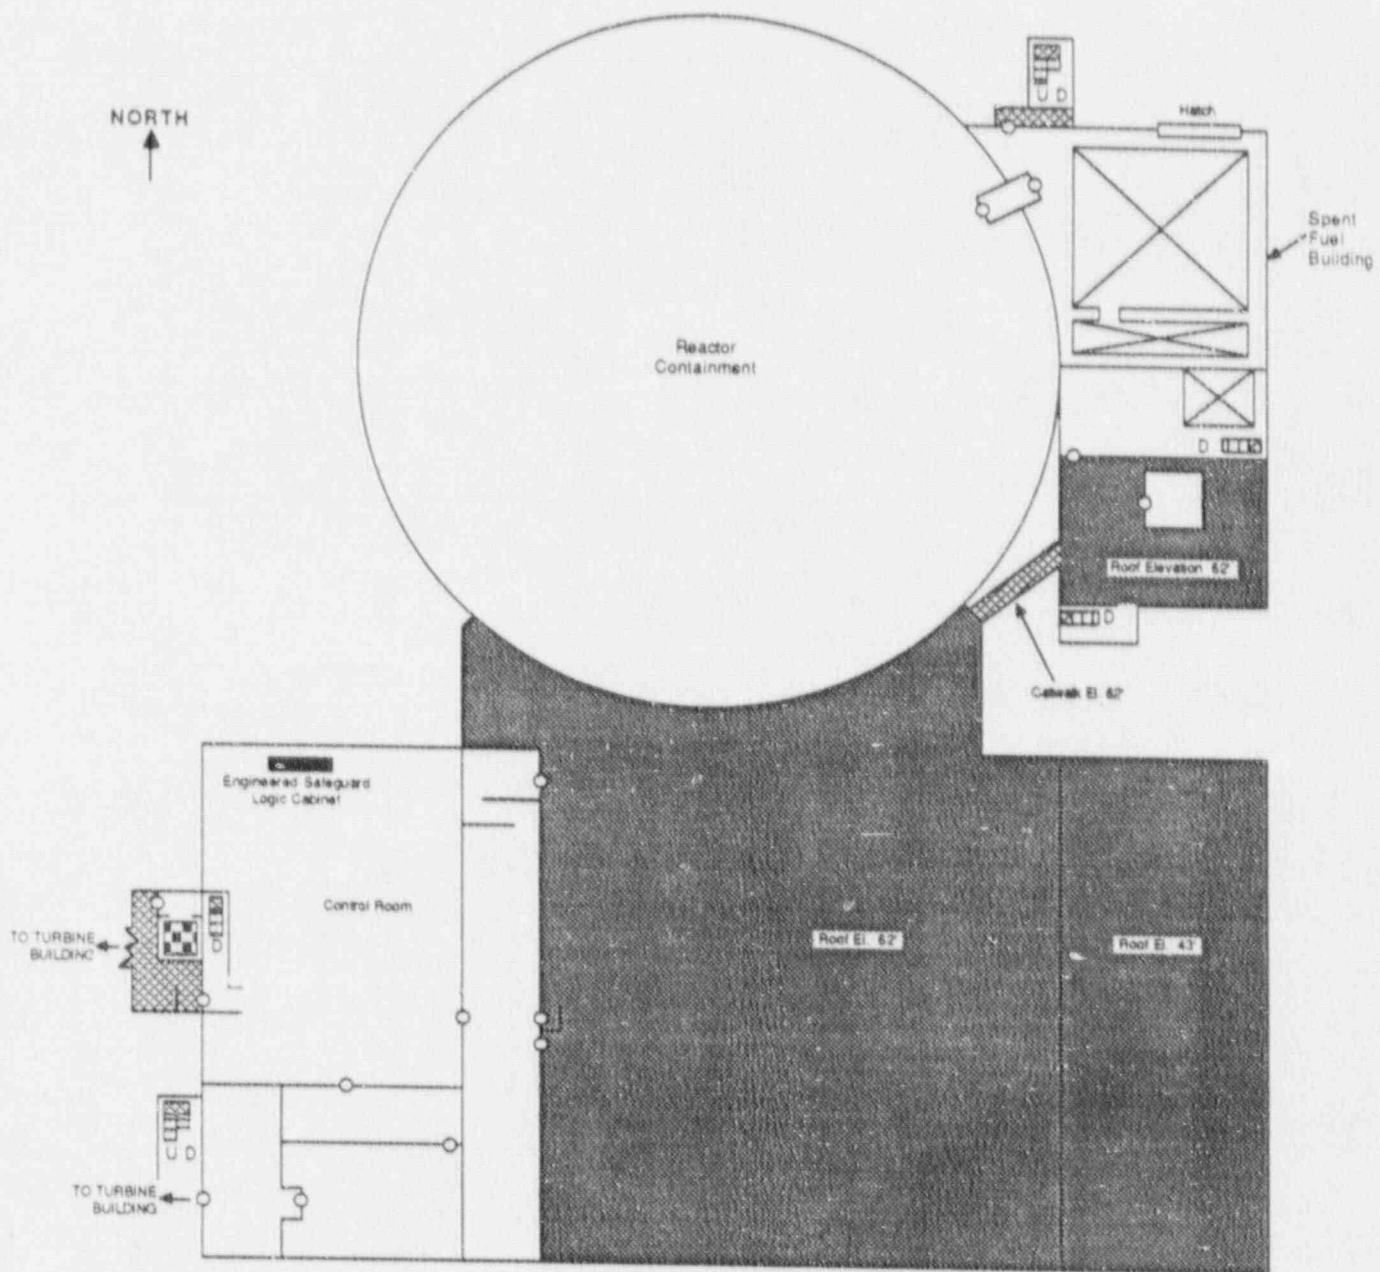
St. Lucie 2 Reactor Building, Auxiliary Building, and Fuel Handling Building, Elevation 62'
